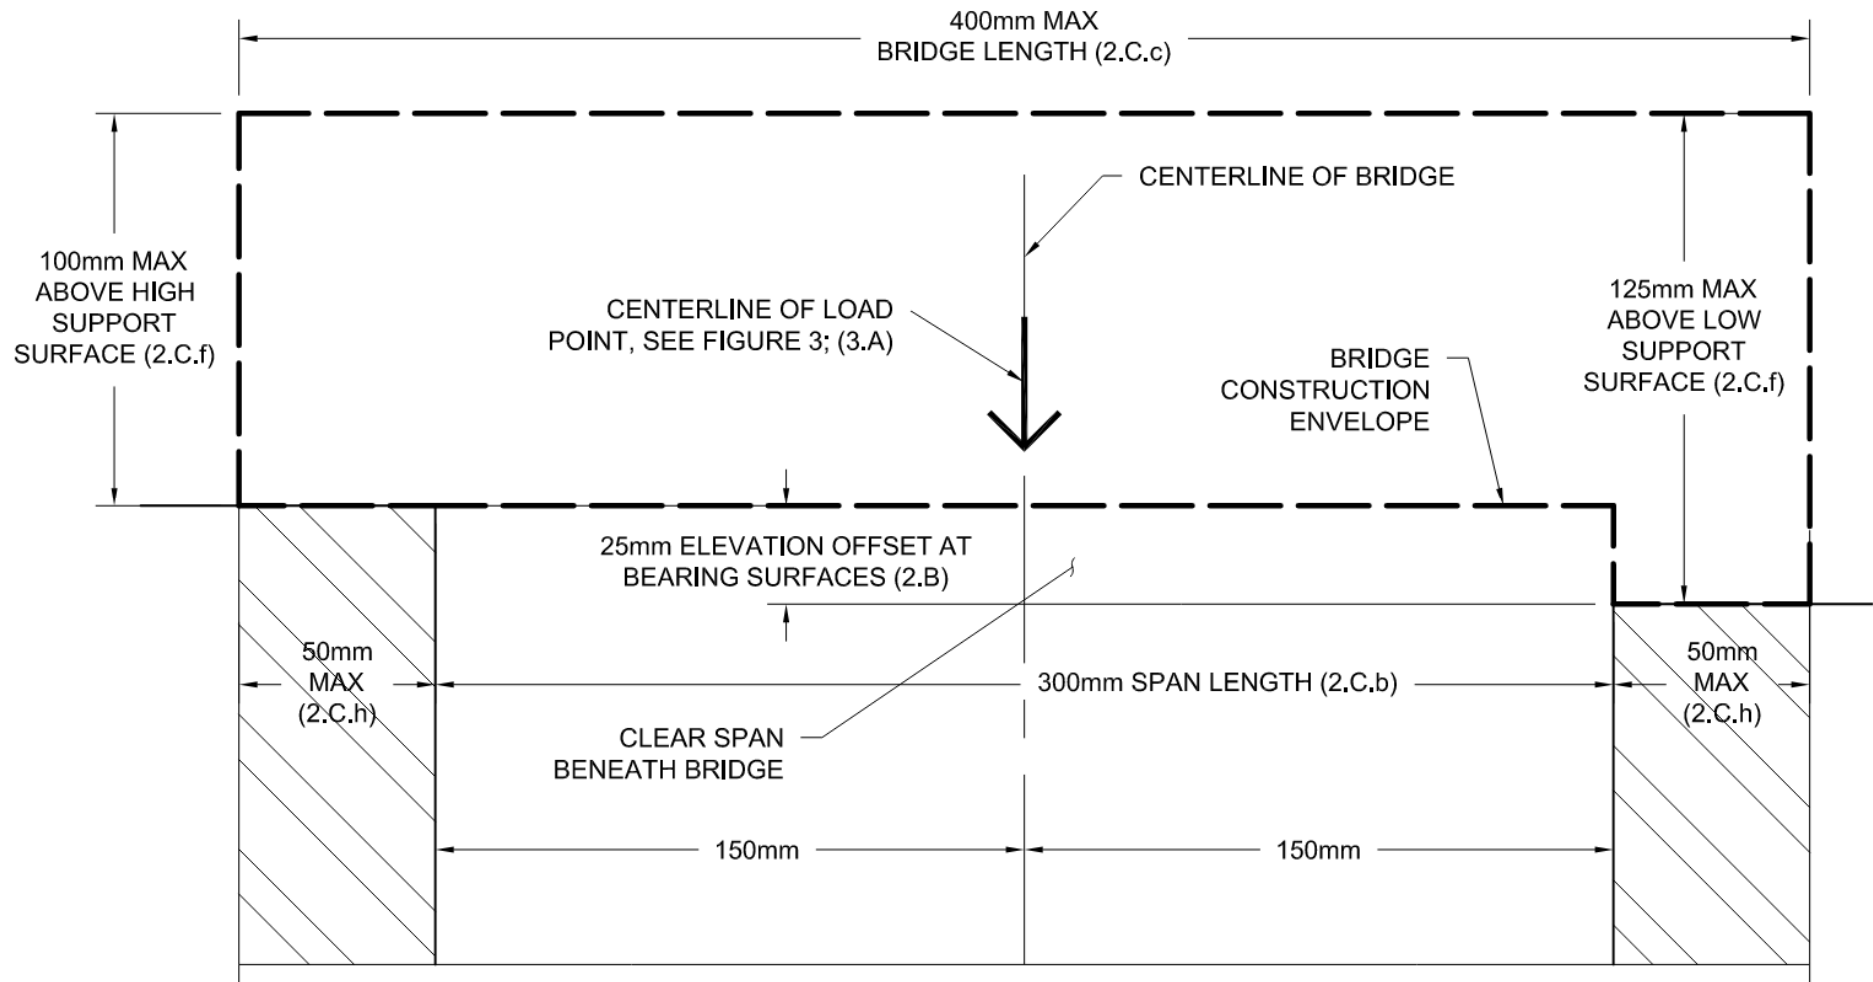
SUPPORT SURFACE AND BRIDGE ENVELOPE DIMENSIONS (PLAN VIEW-NOT TO SCALE)
